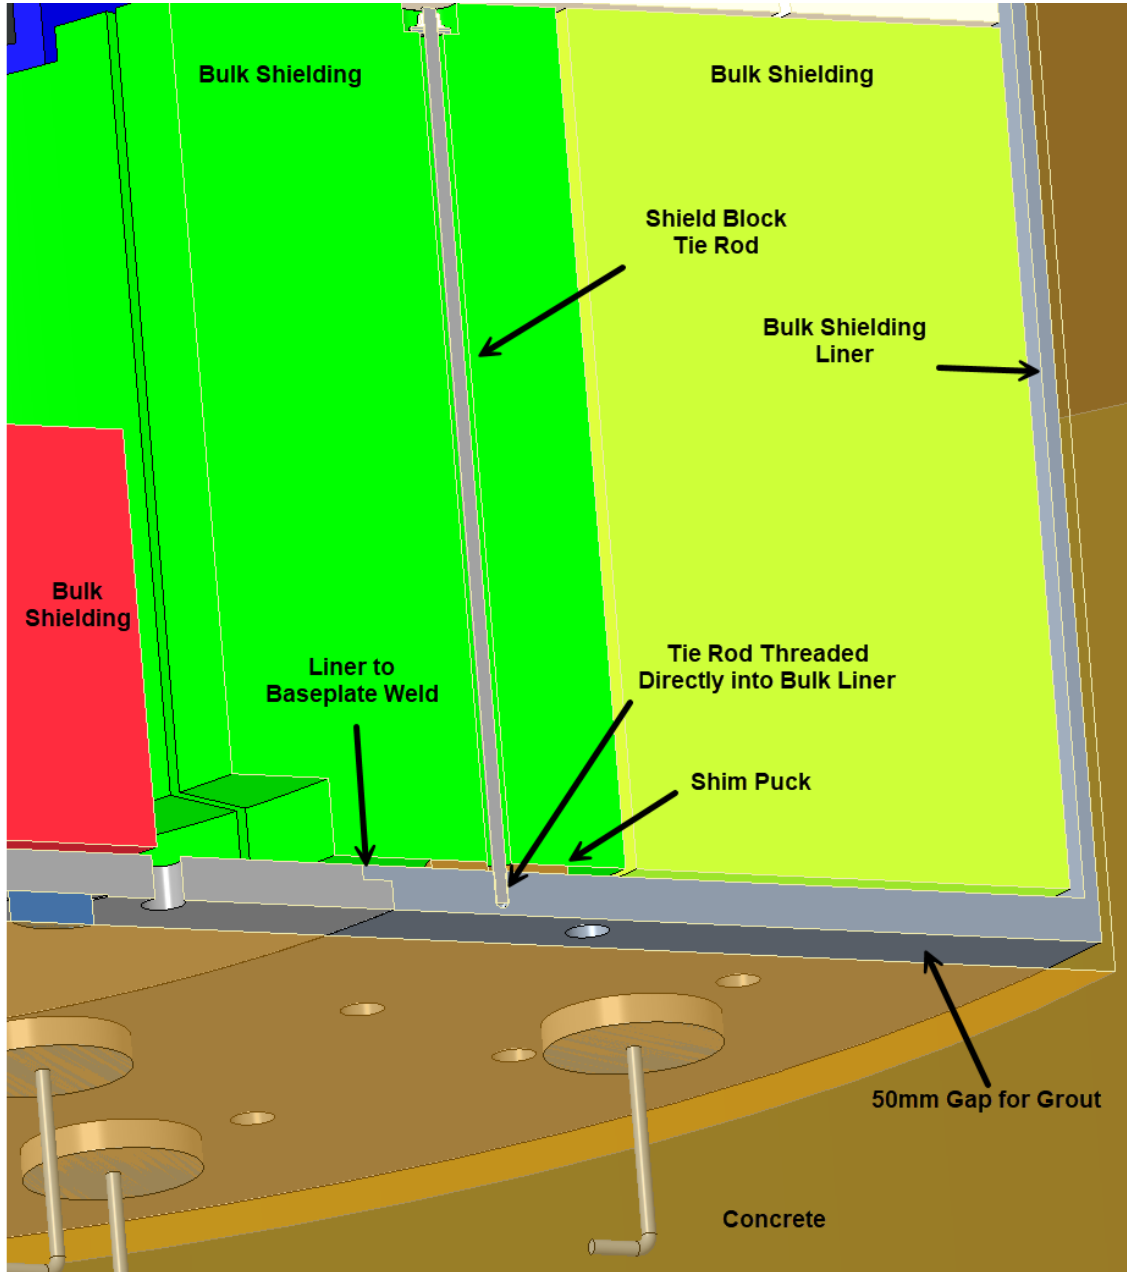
Cross sectional view showing bulk shielding liner and anchor system.
